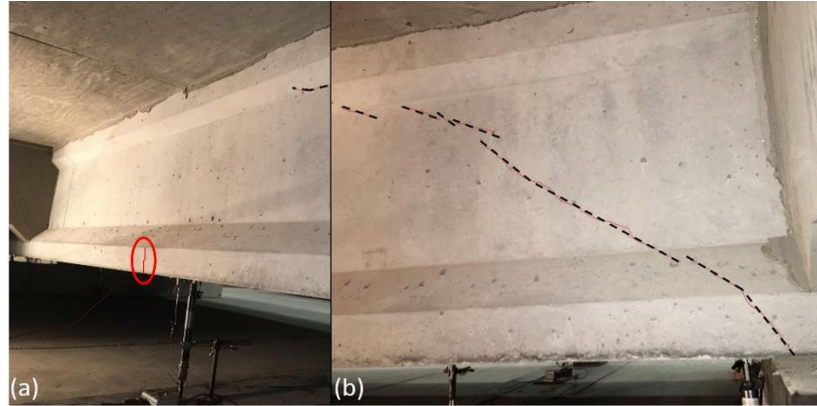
Cracking at 63 kips of load (a) flexural crack near midspan (circled), (b) shear crack near the support for the loaded girder
